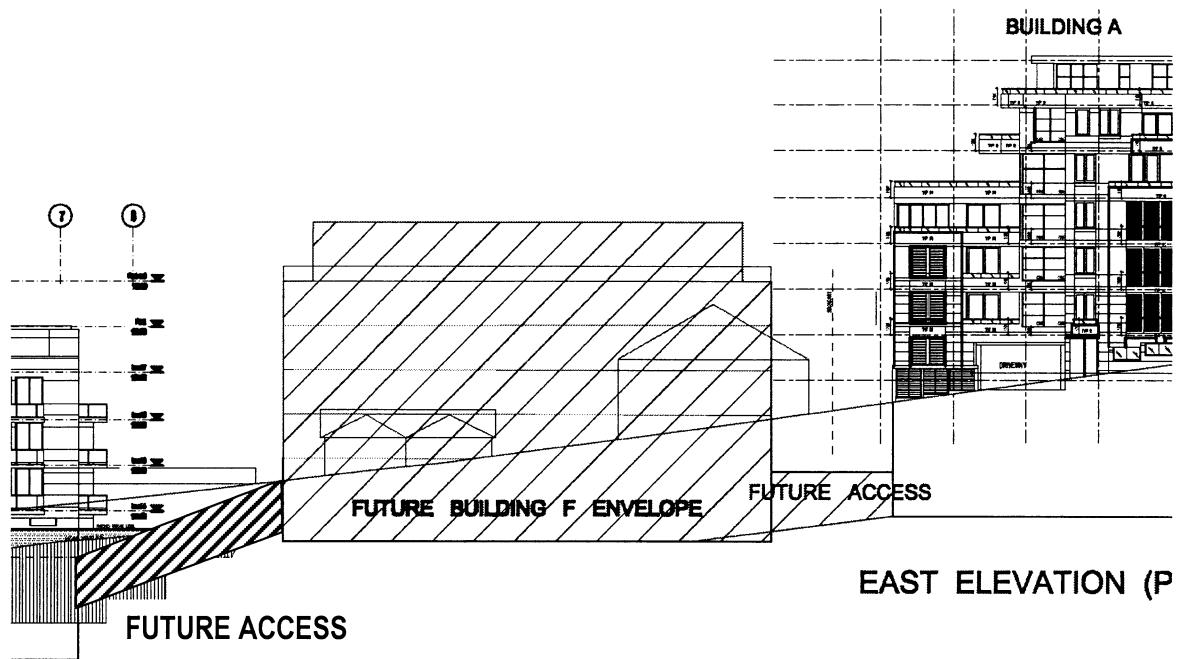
East elevation/section diagram showing potential access from Meriton's Block A or Block E to future Block F
